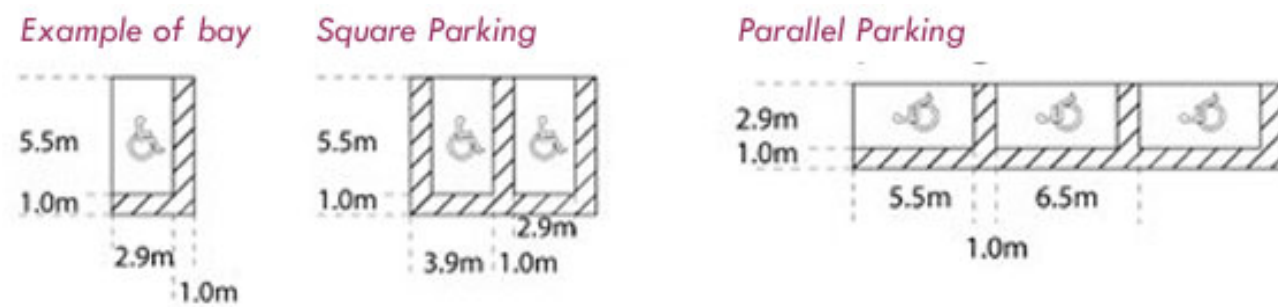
Disabled Parking Arrangements | NRDG, Section 3.5.11
